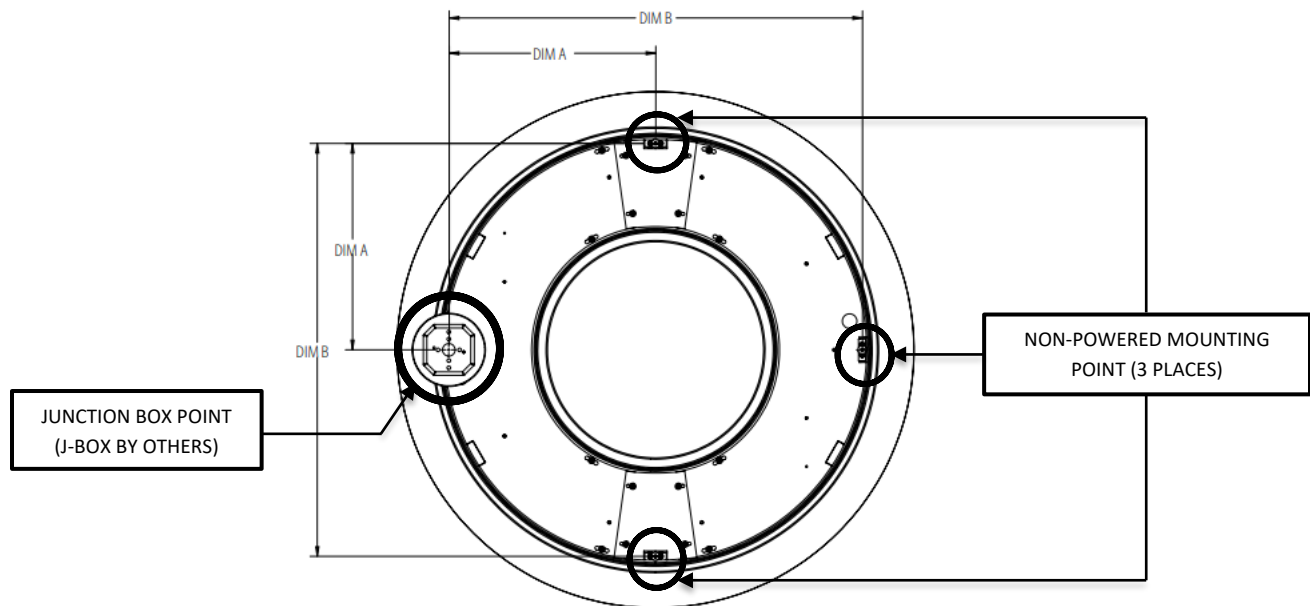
TOP VIEW SHOWING MOUNTING INFORMATION
